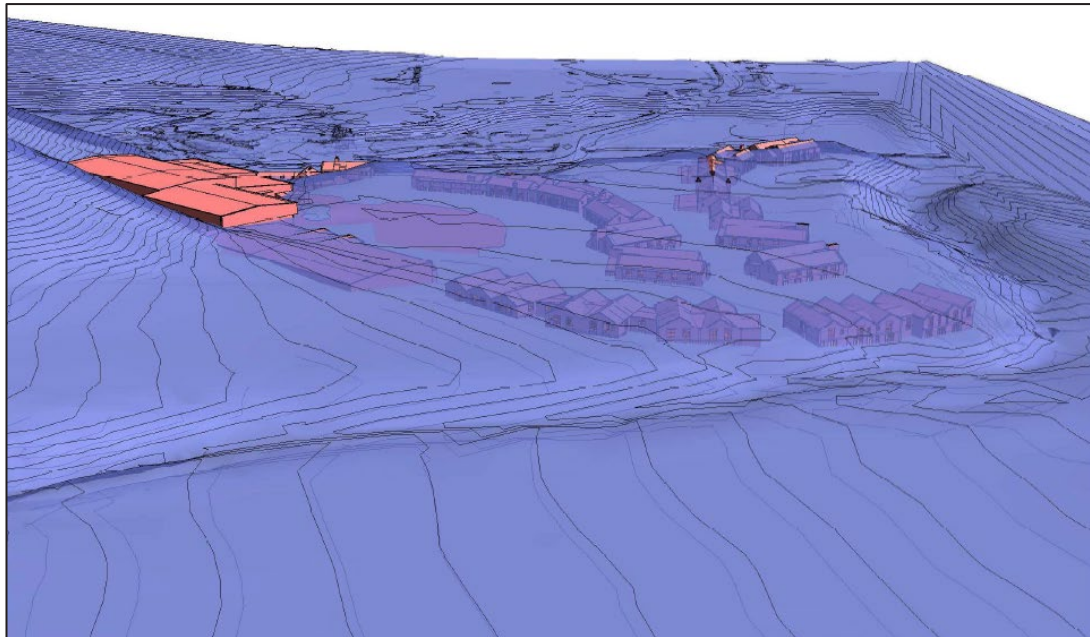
Height Planes. Source: Architectural Drawings '8m Height Overlay' Sheet 5.2 dated 27 June 2025 (Appendix 9)
